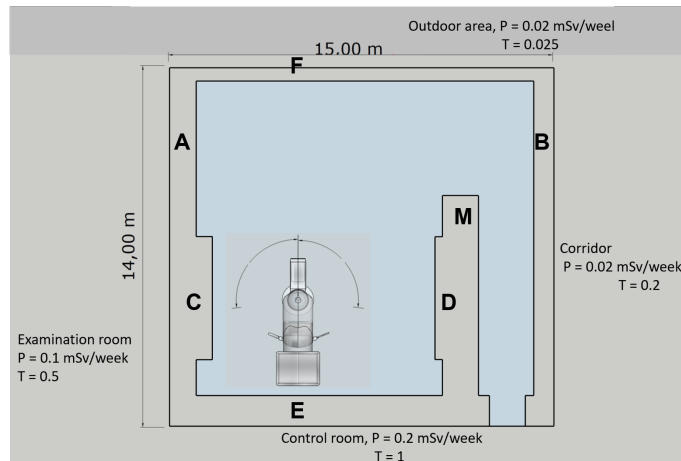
Bunker layout and labels used for primary (C, D) and secondary barriers: A, B, E, F. (top view).
